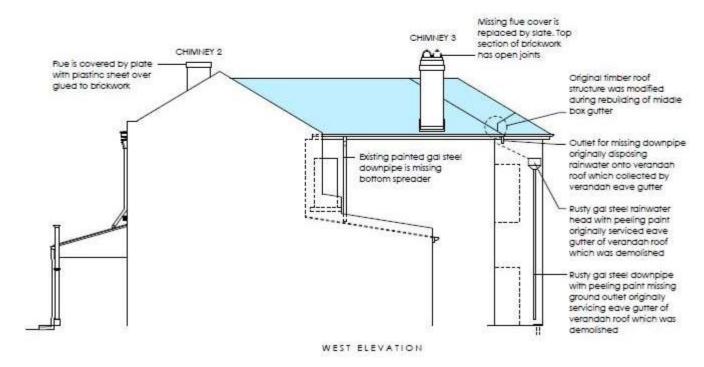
Condition Assessment Drawing (West Elevation). Source: OCP Architects 2024.
